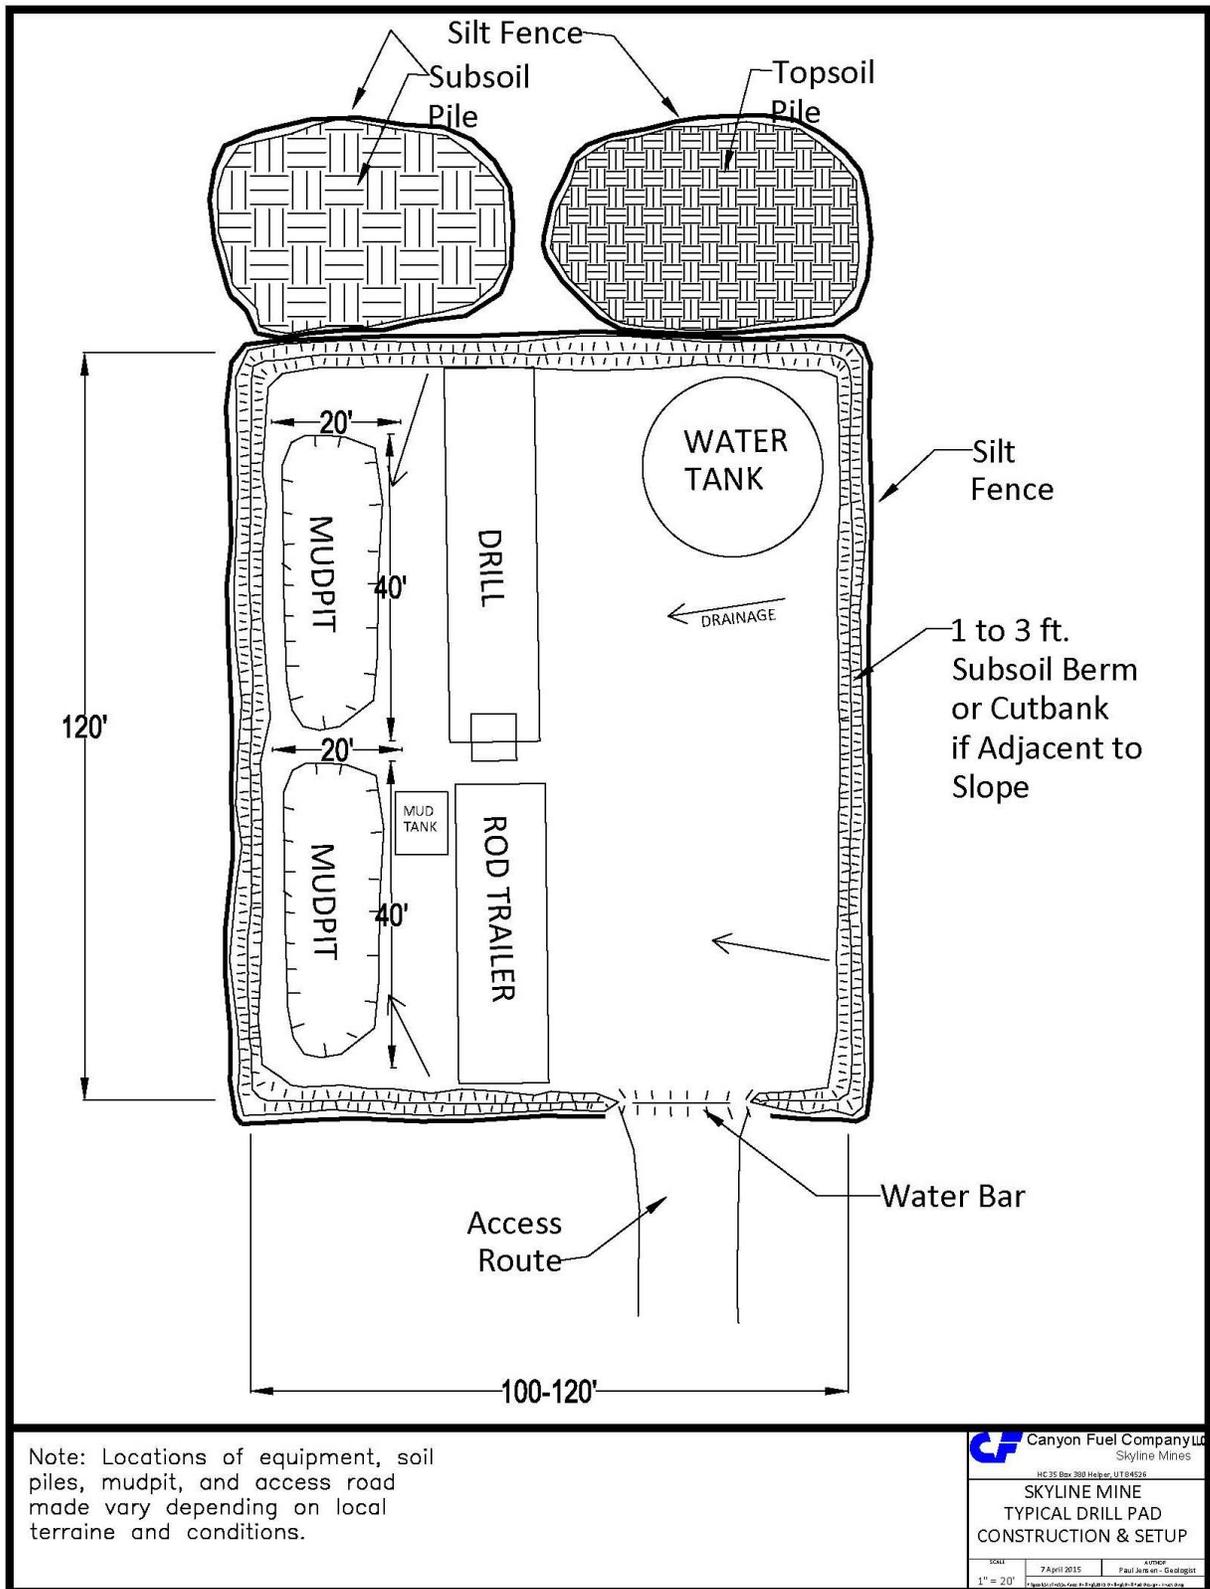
Typical conventional drill site setup. Note: The berm will be constructed of excavated mud pit material or imported material.
